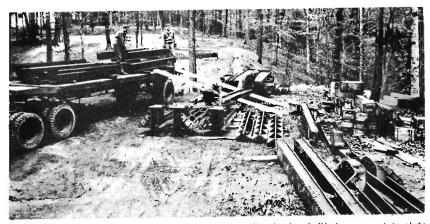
Unloading light steel sections from a trailer by hand. Skids are used to slide beams to the ground.
